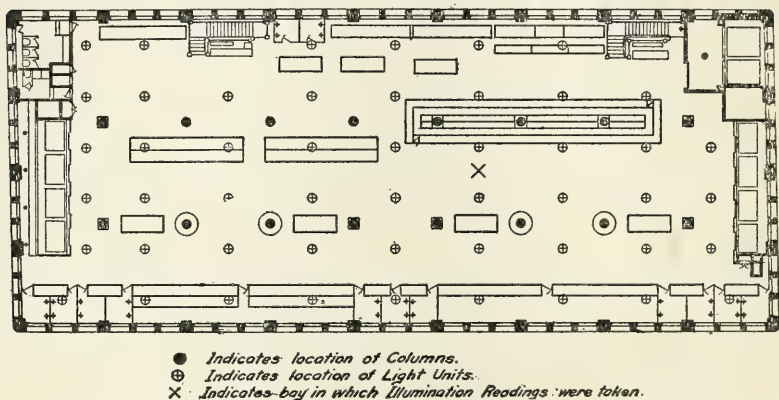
Plan typical of the general arrangement of furniture, light units, etc., on the upper floors, with exception of eighth.
